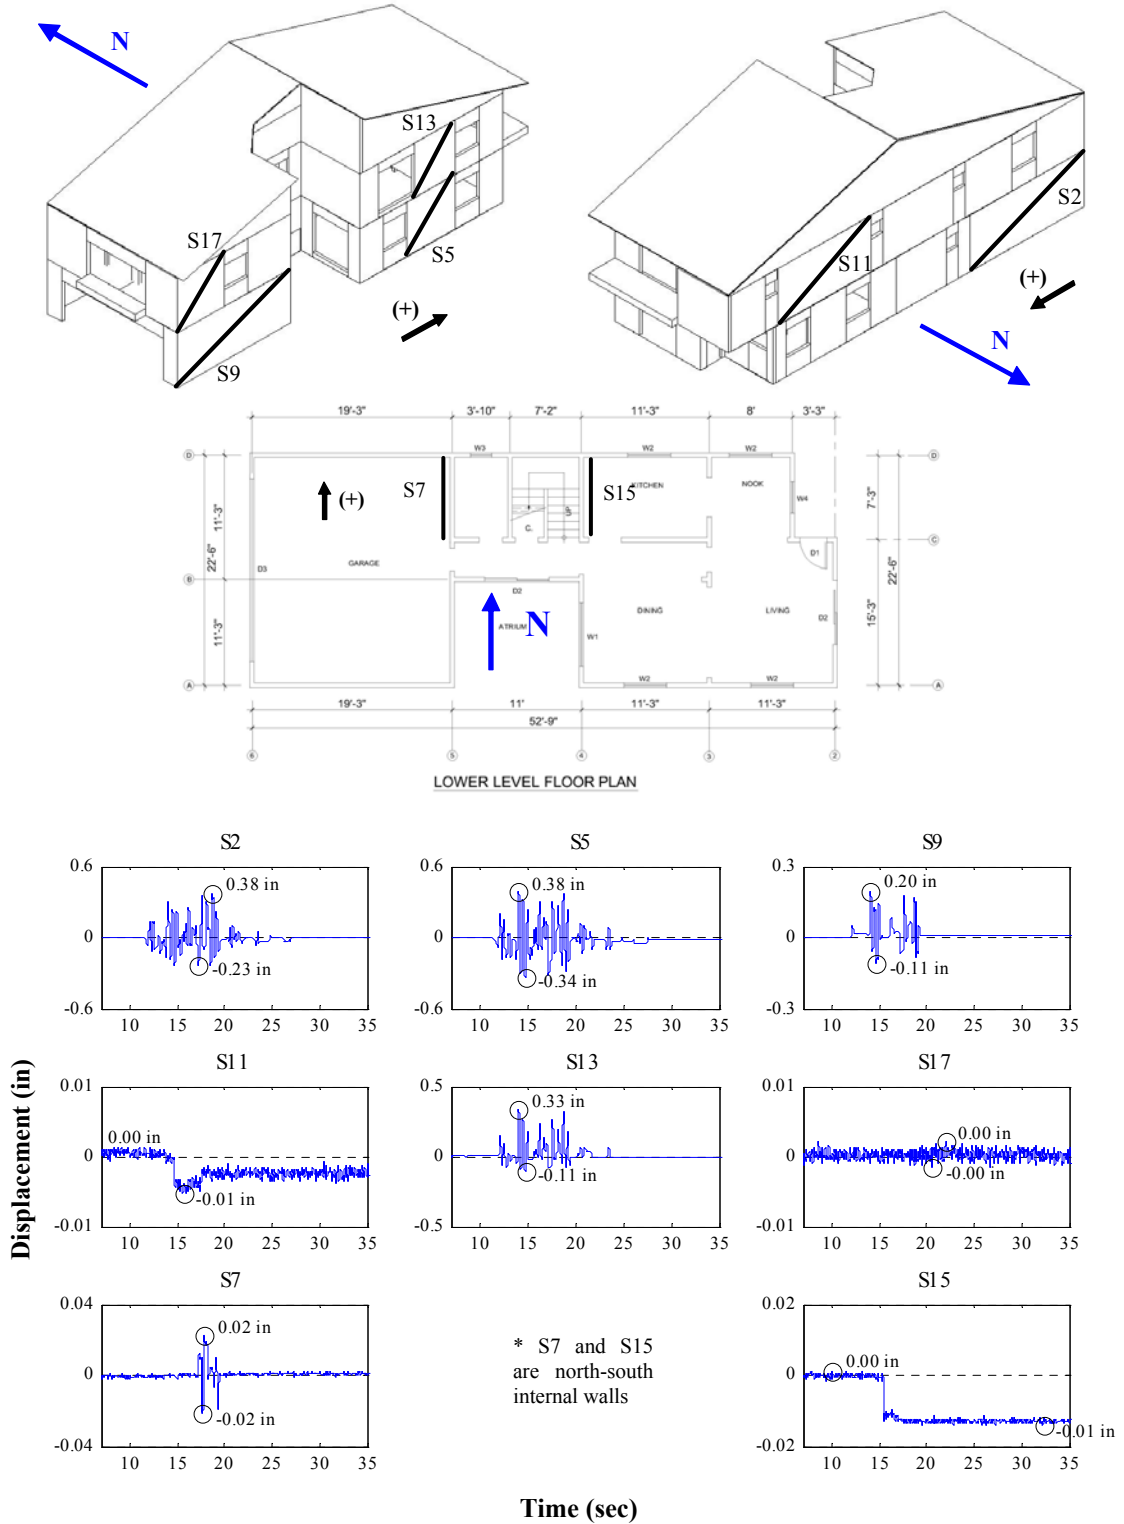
Wall deformations of east-west internal walls for Test NWP2S13
